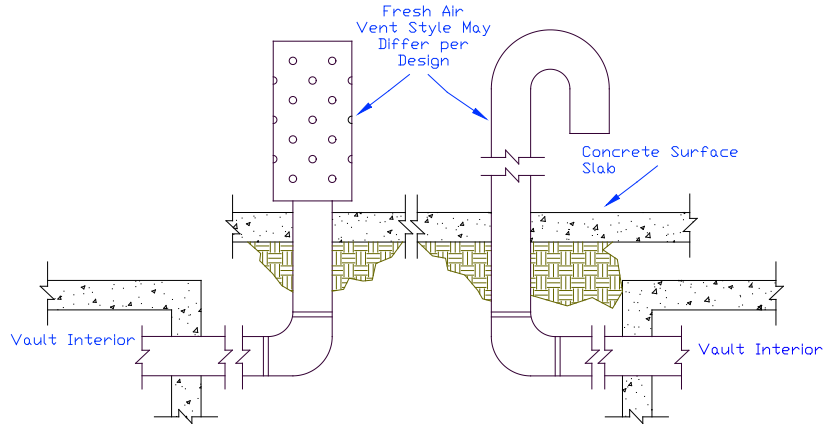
Sectional Views of Typical Vaulted AST (Ventilation)
